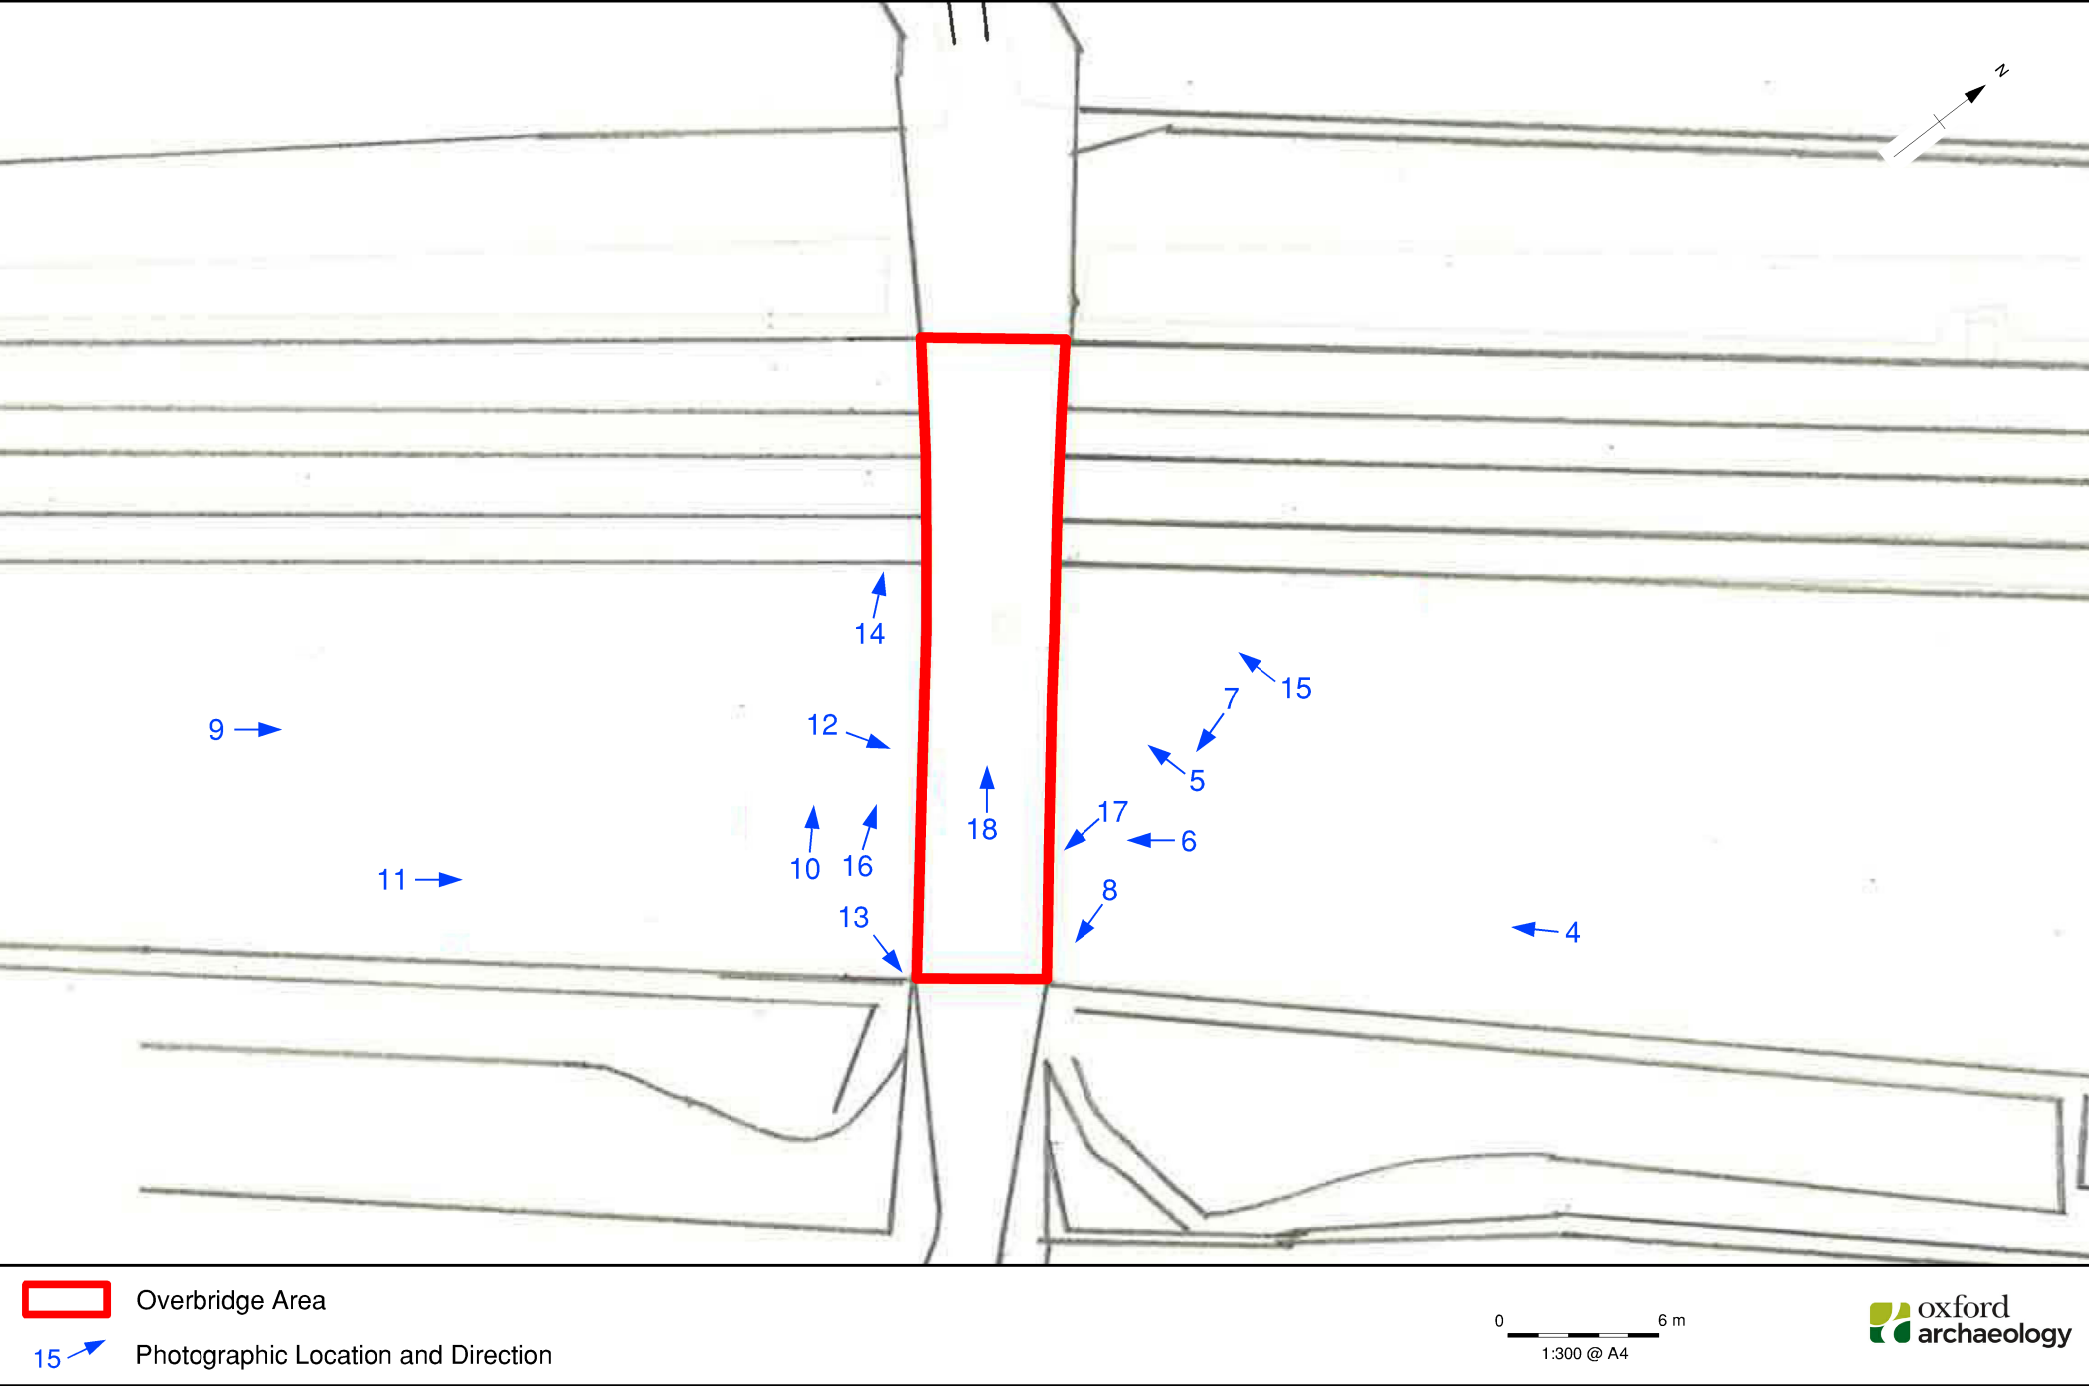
Wheatley's (Colliery Lane) Overbridge (MVL3/103) Photographic plan
